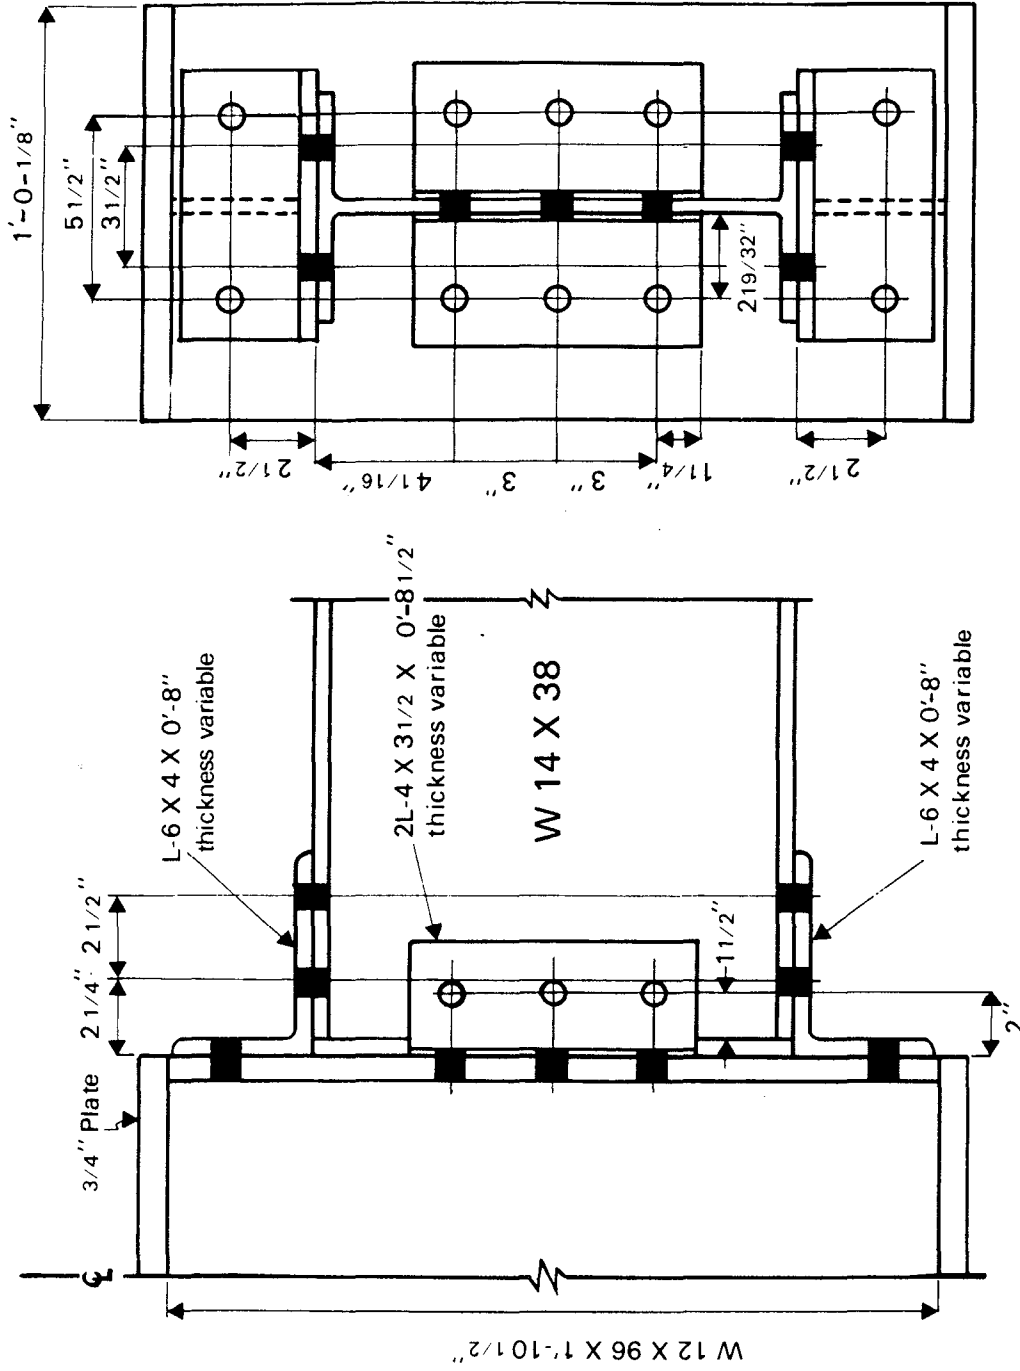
DETAILS OF CONNECTION FOR W14X38 BEAM — BOLTED SPECIMENS
